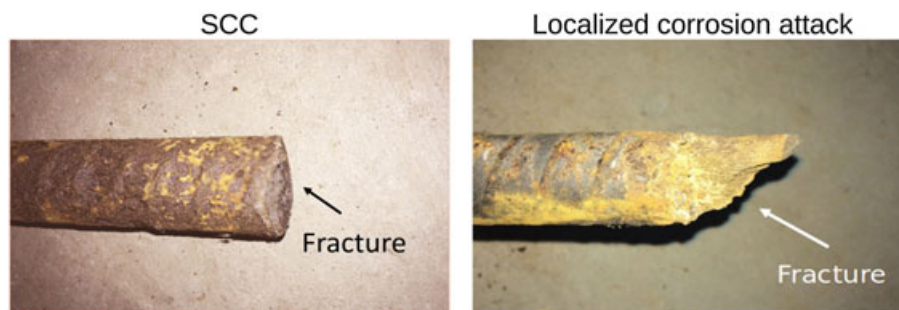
The left graph is side view of failed rock bolt due to SCC; the fracture occurs perpendicular to the axis of the bolt. The right graph is side view of failed bolt due to localized corrosion attack; severe section loss occurs on the surface of fracture [Colour figure can be viewed at wileyonlinelibrary.com]
